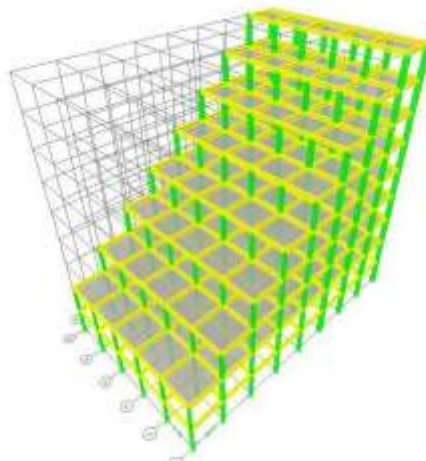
Three dimensional view of setback building for eight storey model (00 slope)
